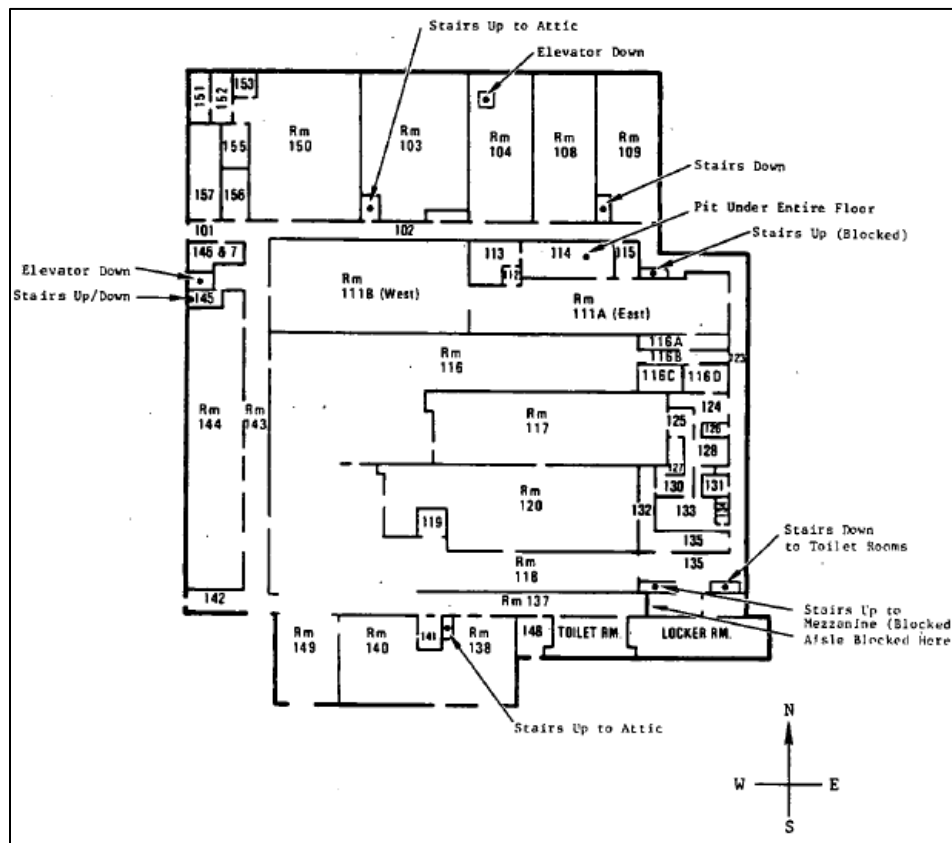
Main floor layout, Building C-West [GE 1984, p. 12].
